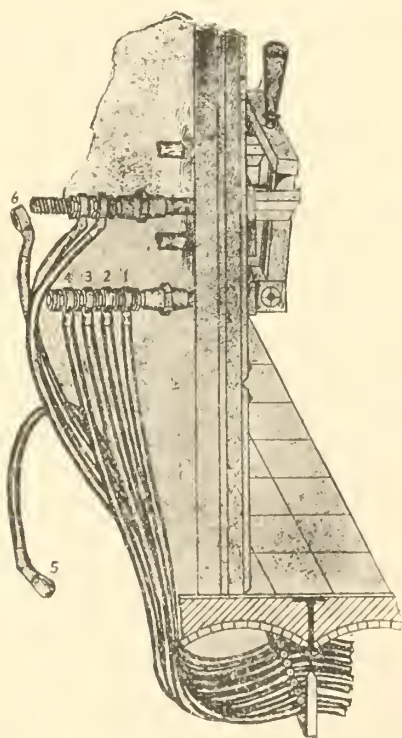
SHOWING METHOD OF CONNECTING CABLES TO SWITCHBOARD.
